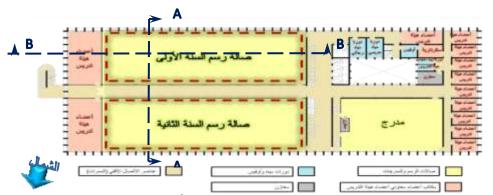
Horizontal skylight of 3th floor of the University. Two drawing rooms are shown.
